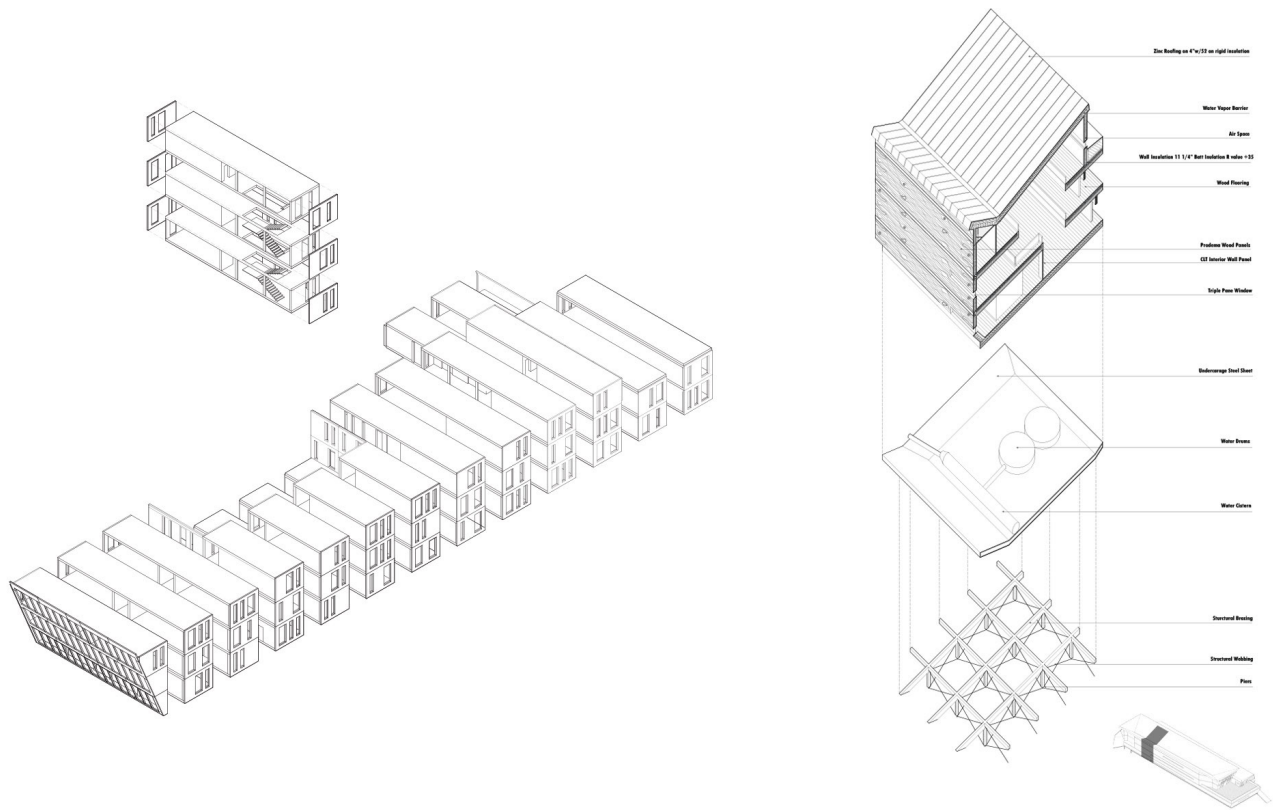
Building module drawing and exploded isometric drawing demonstrating constructability and assemblage of students' design for prefabrication. Image Credit: Joseph Garcia, (left), and Robin Hatherill, (right).
